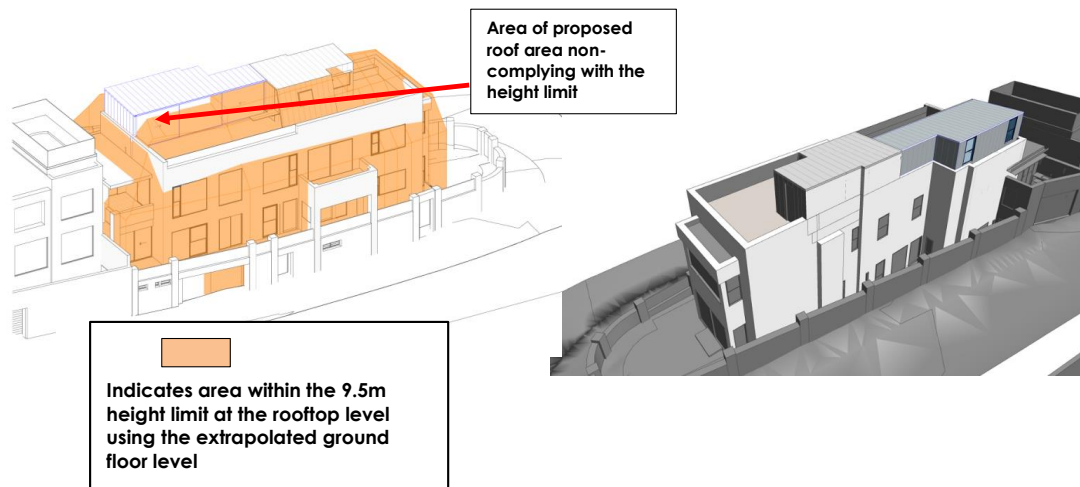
Maximum Buildable Area Diagram (Source: Dreamscapes Architects)
